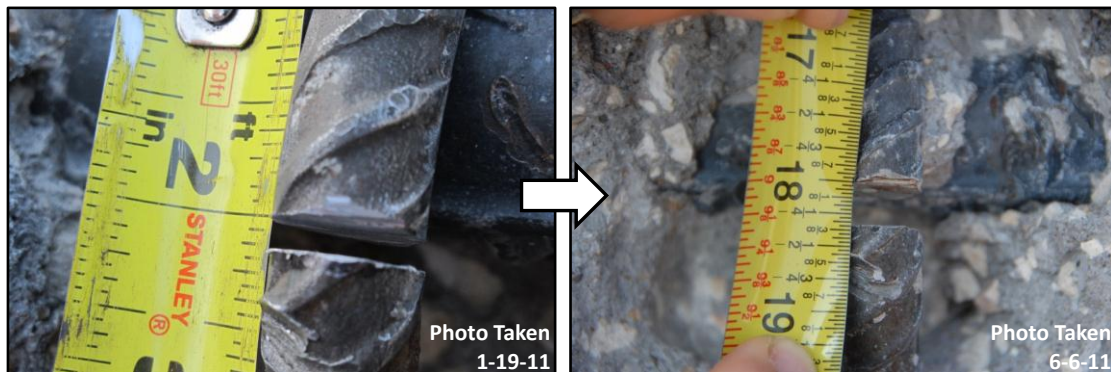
Growth of Cut in Stirrup due to Concrete Expansion
